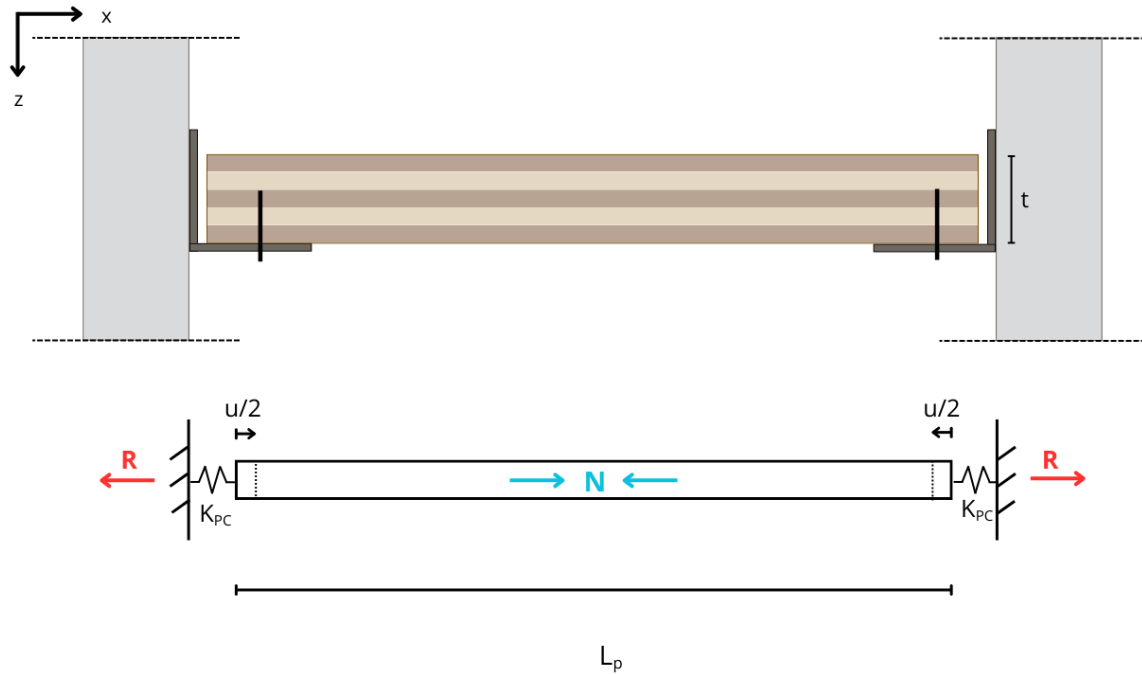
1D beam–spring model of a CLT floor panel between two cores.
